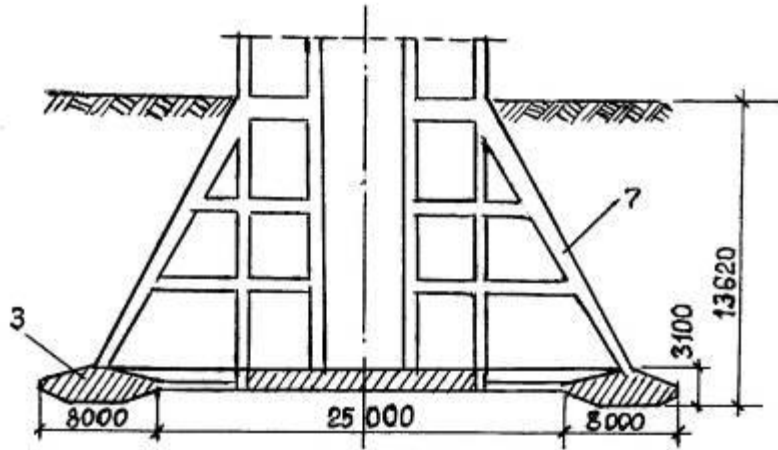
Ring fragment (3) with transition section (7) (Hamburg)
